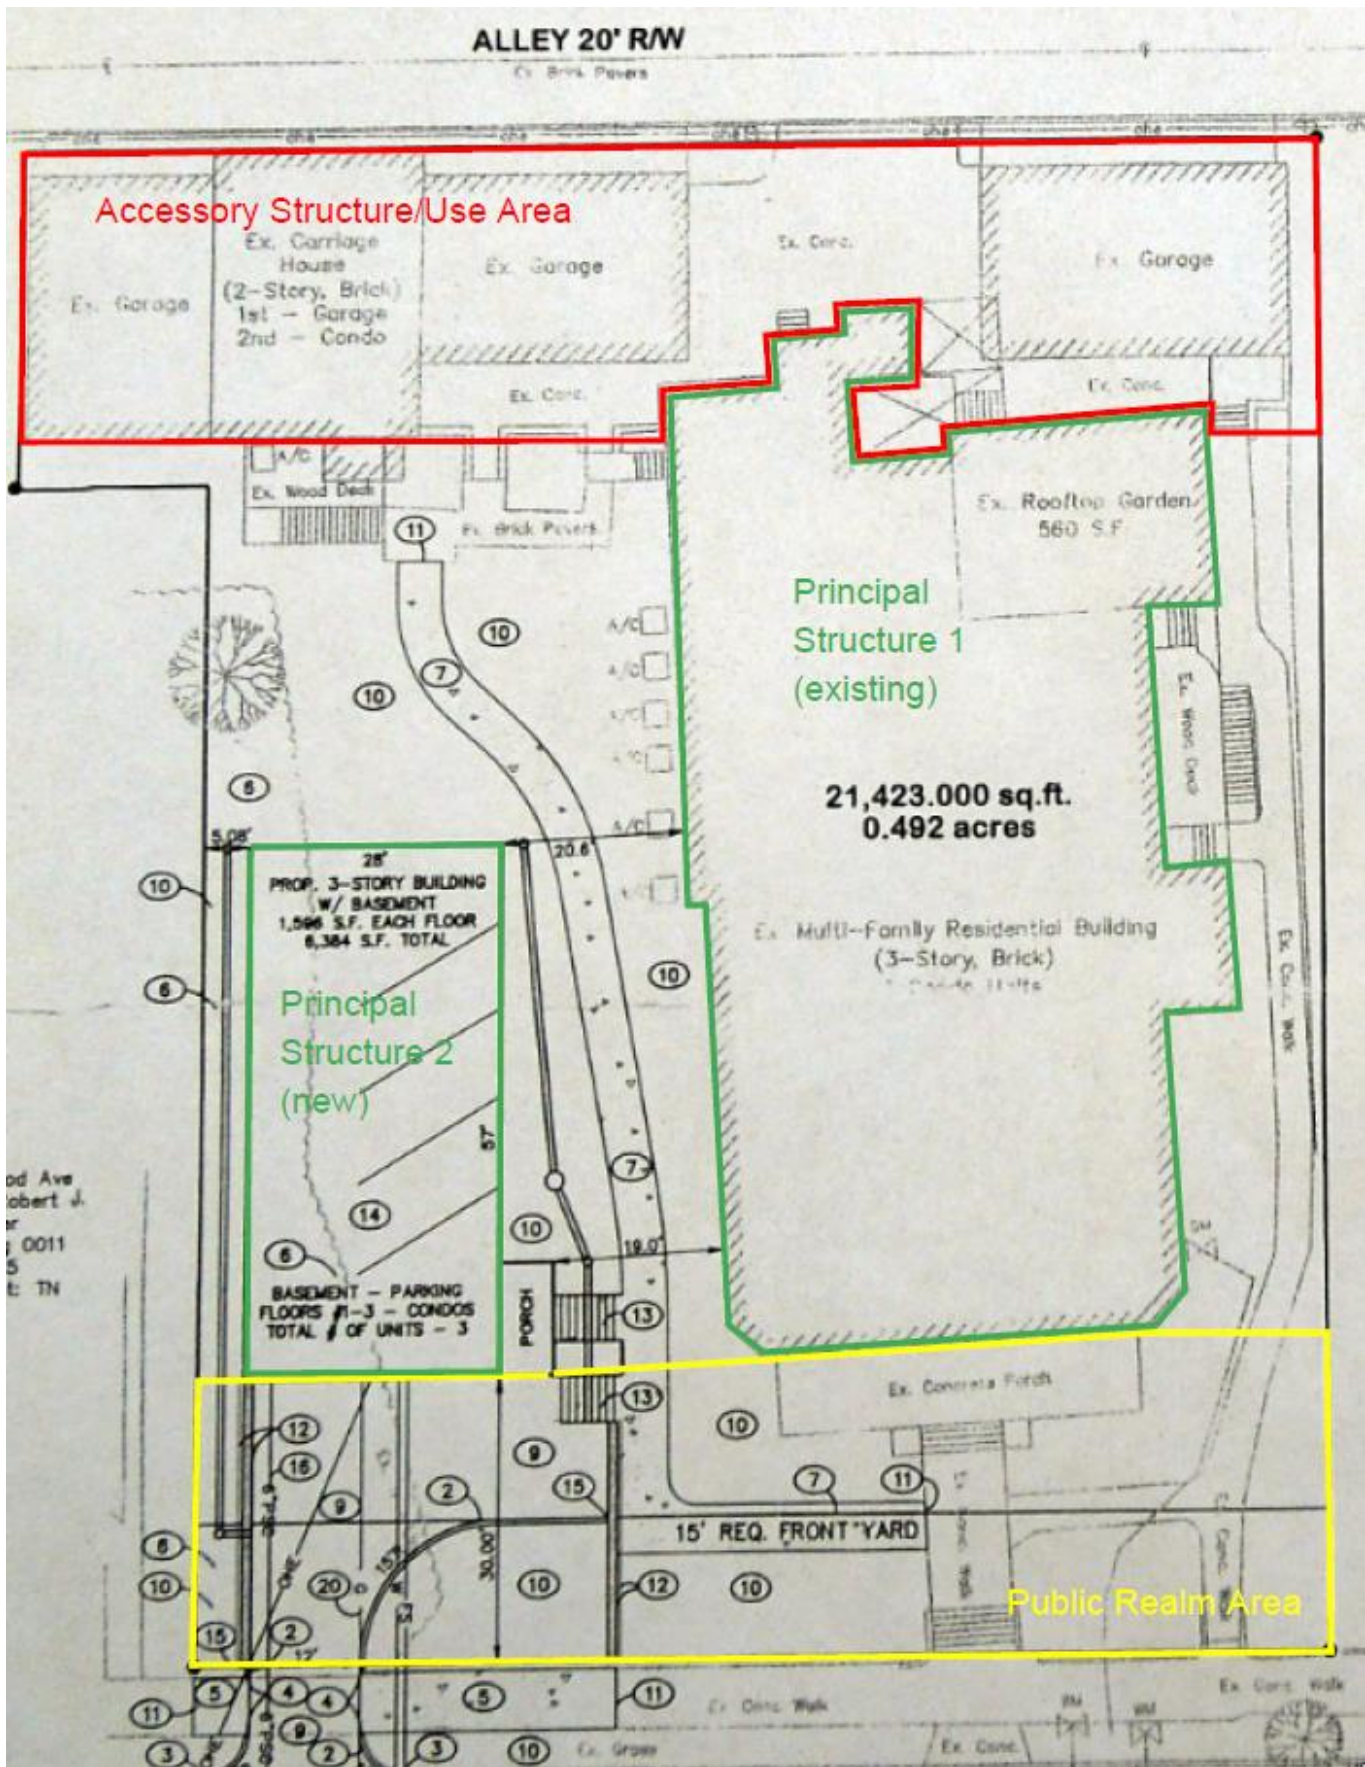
(Based on excerpt of 2013 building permit application document C3 – Site Layout Plan)
